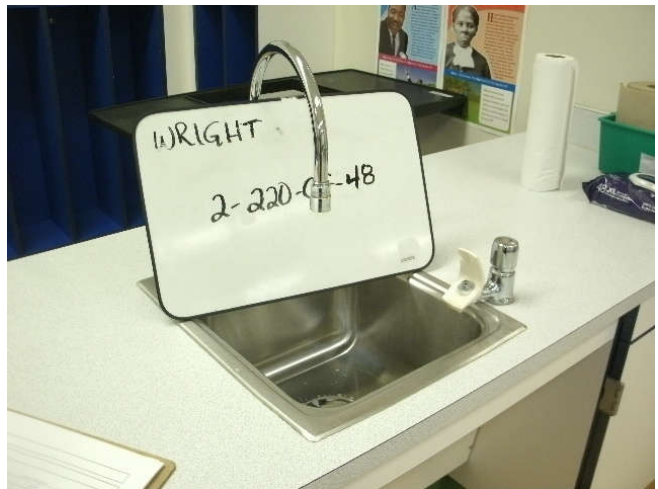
Classroom faucet w/bubbler, located on the 2nd floor, in room 220.
